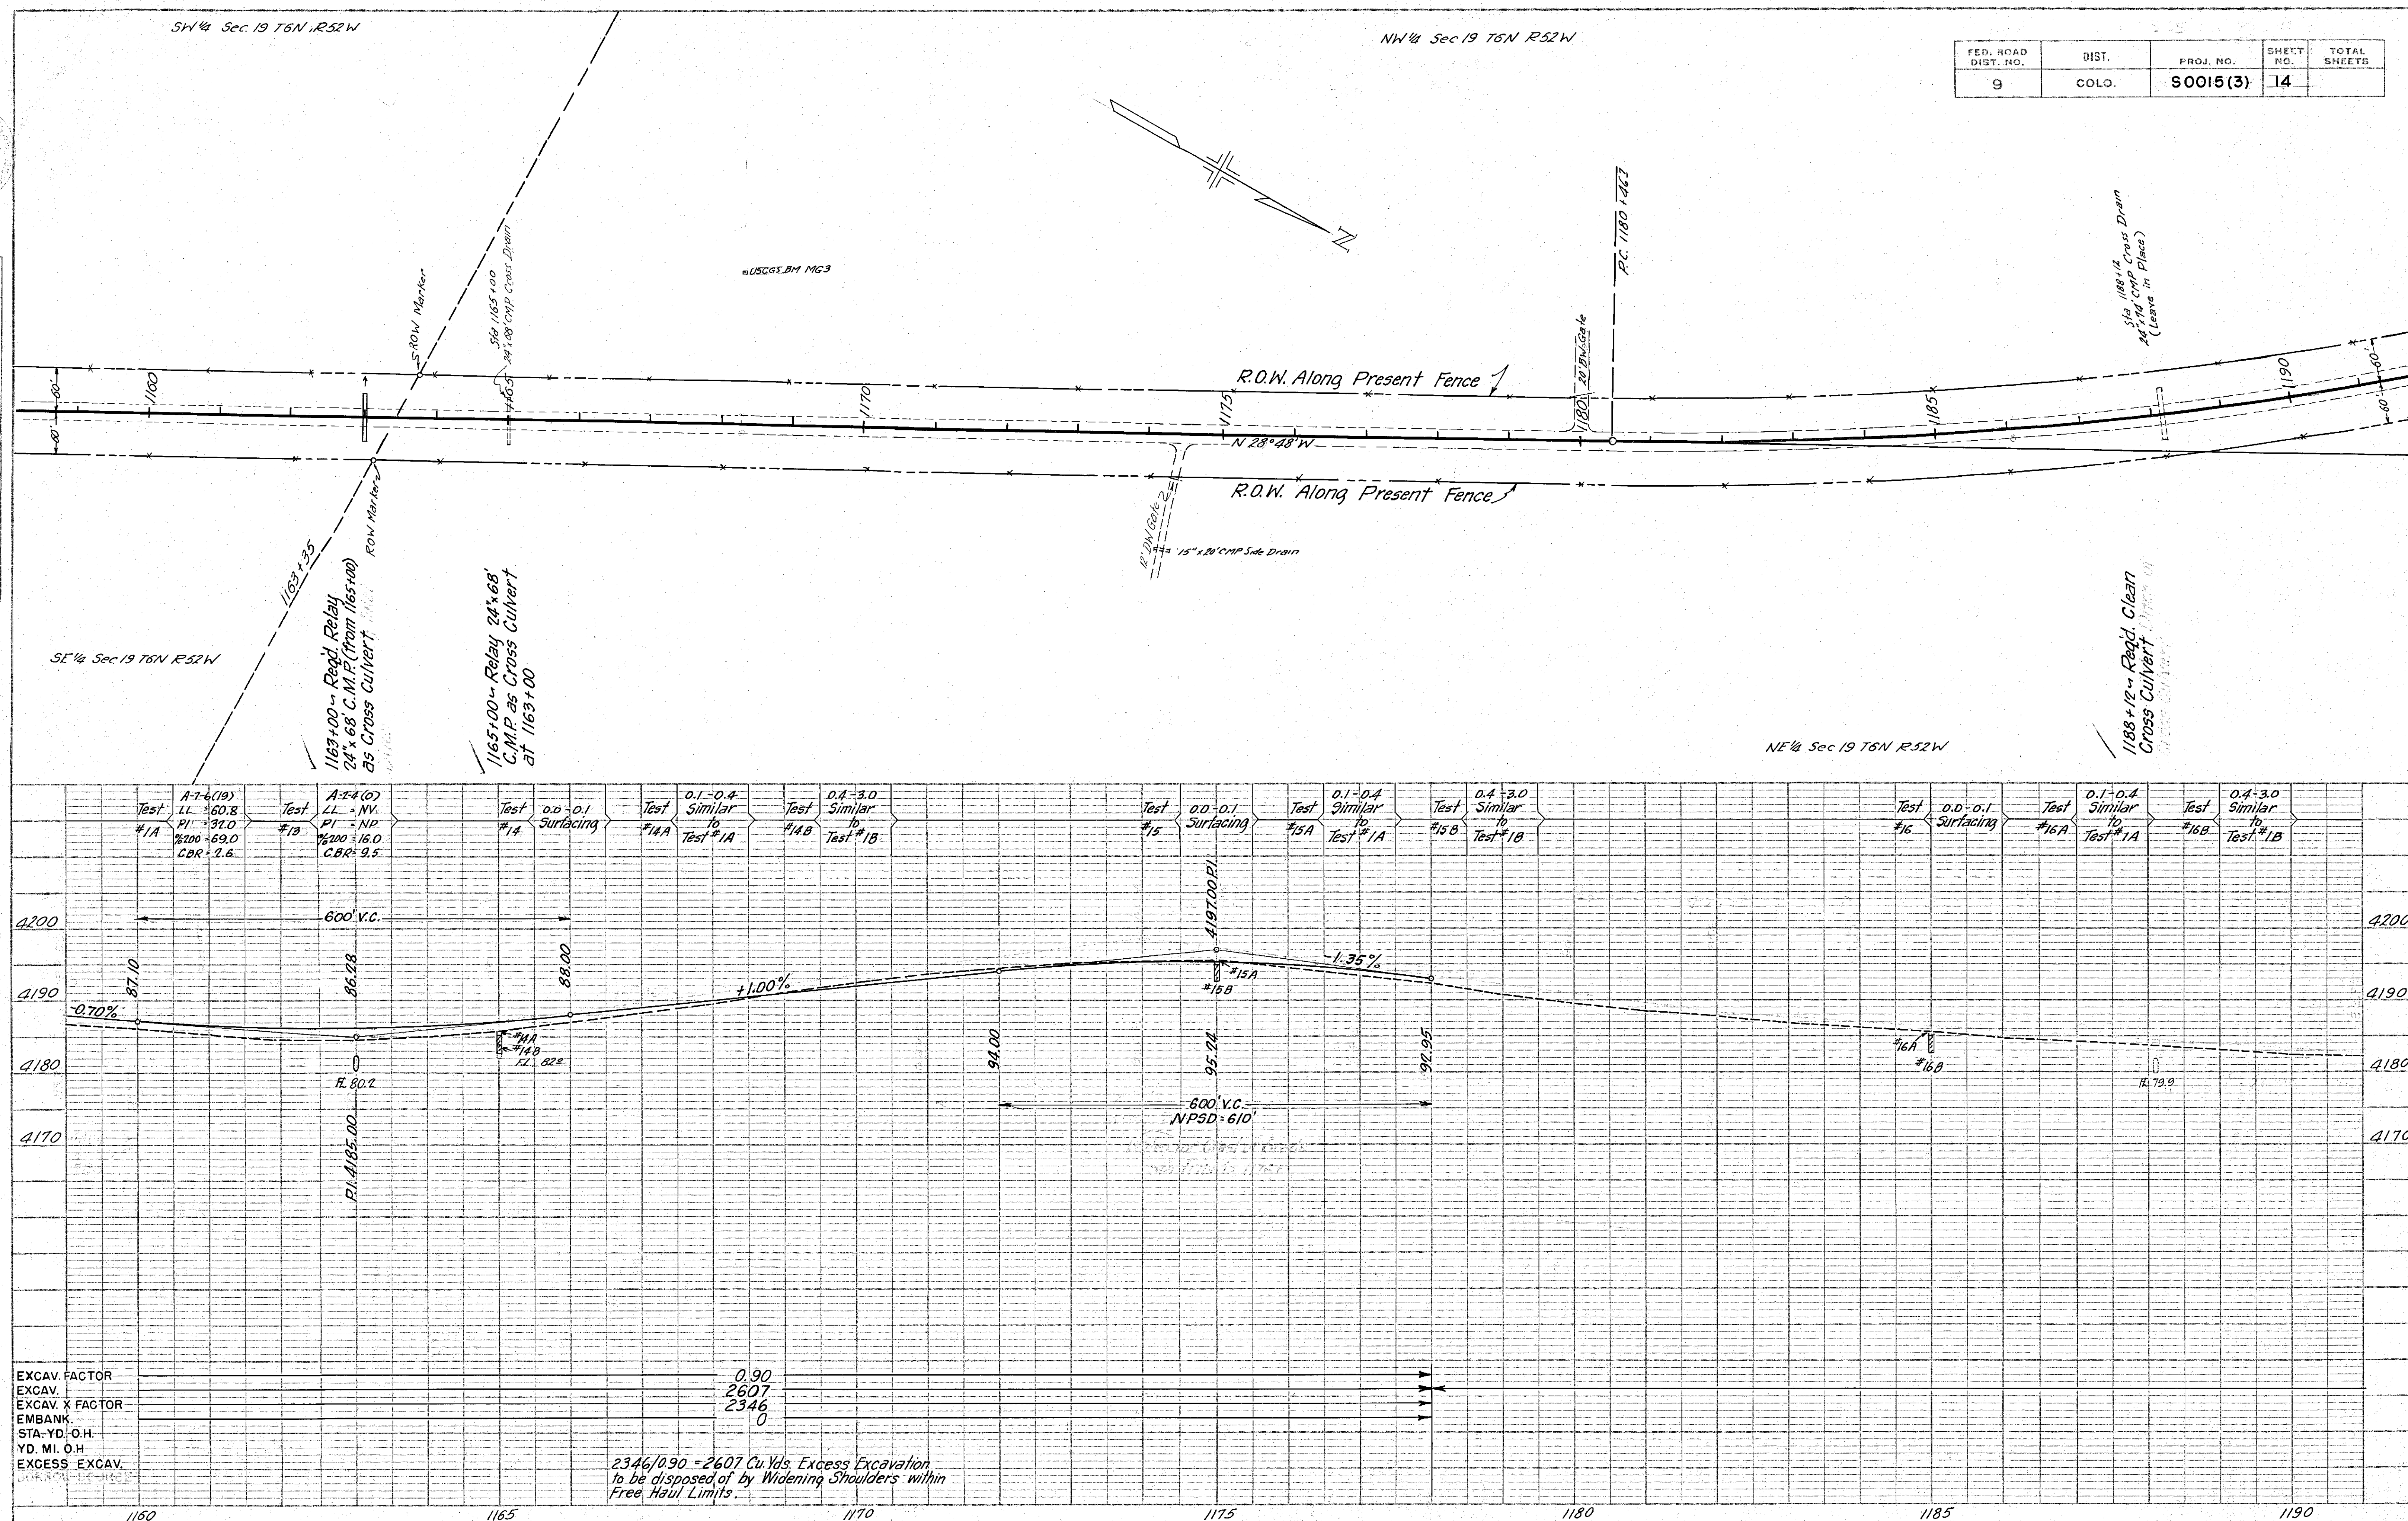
PLAN - PROFILE O. P. R. & R. E. STANDARD
